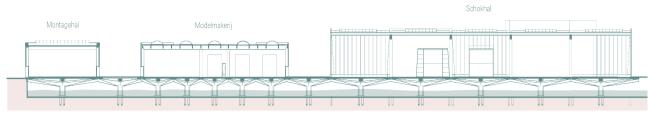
Section Schokbeton on piers after excavation of site (Made by author, 2024)
